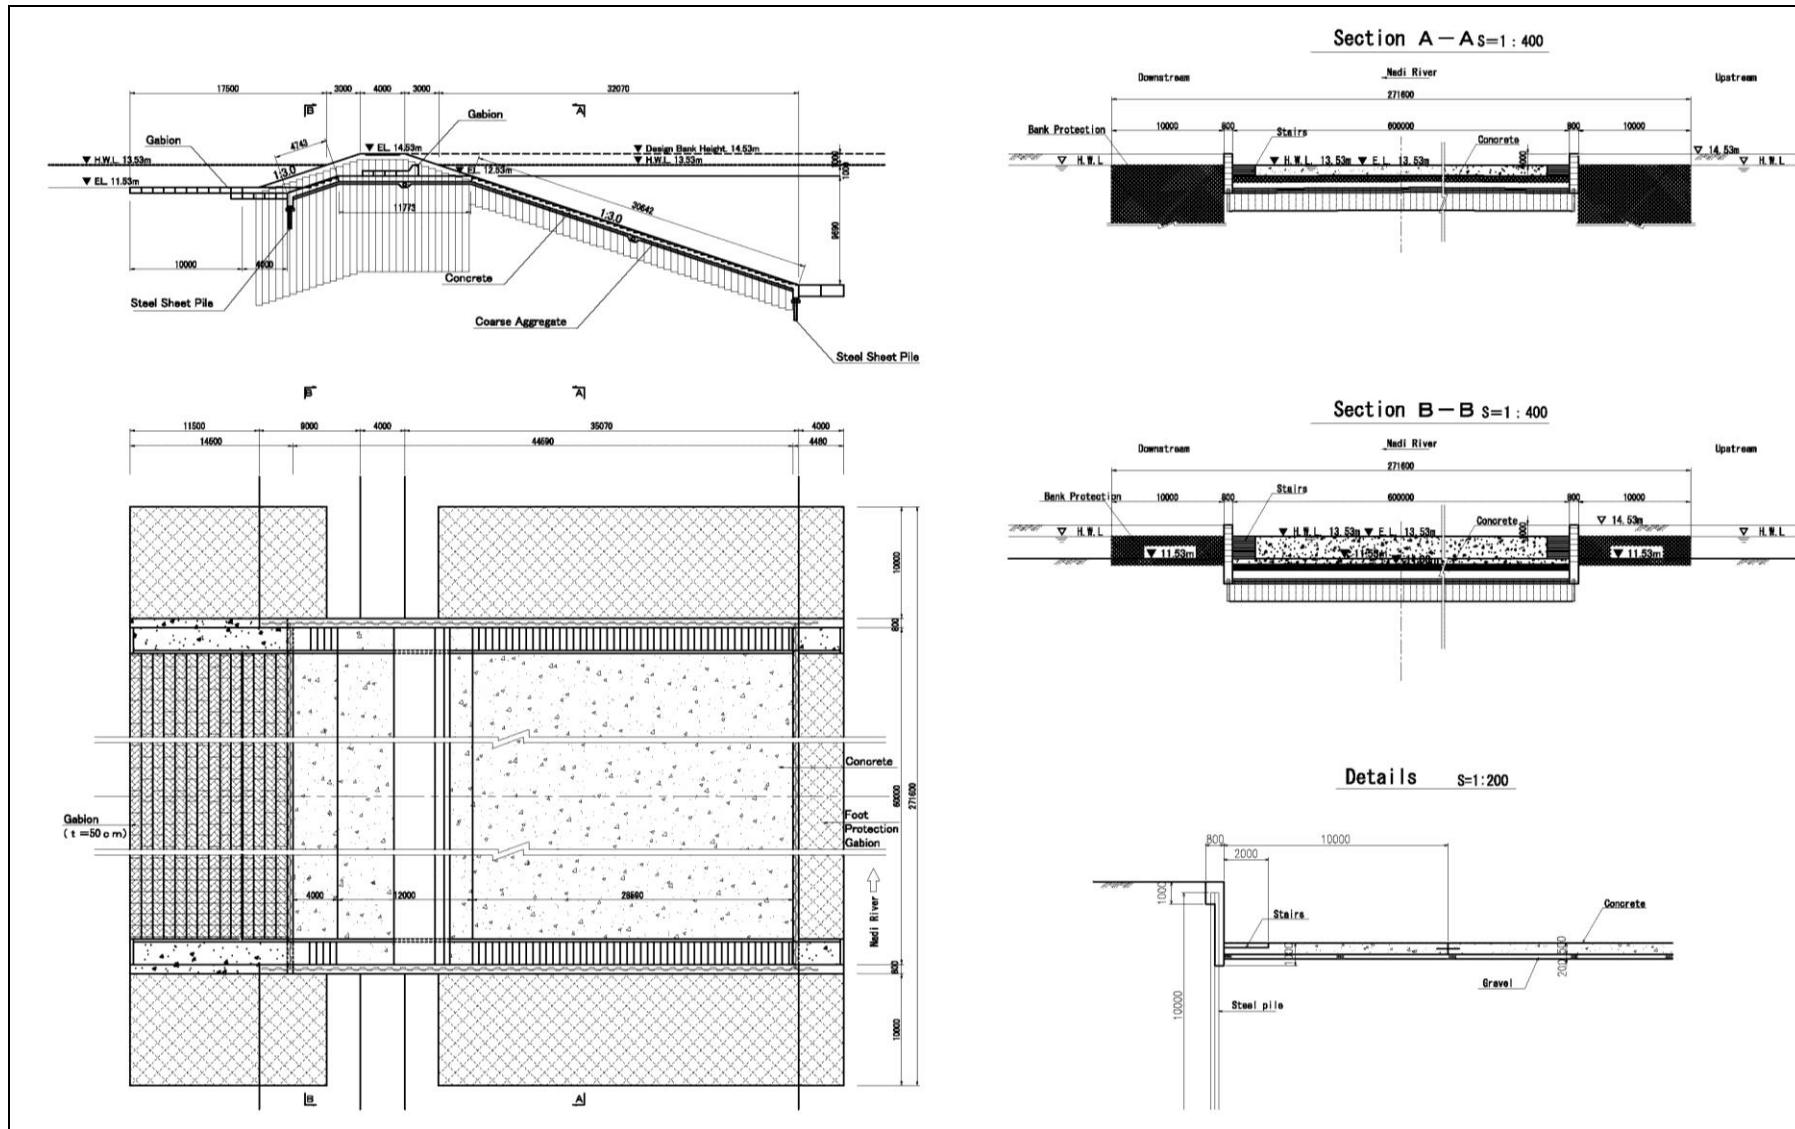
General Plan of Overflow Dike for Retarding Basin A
